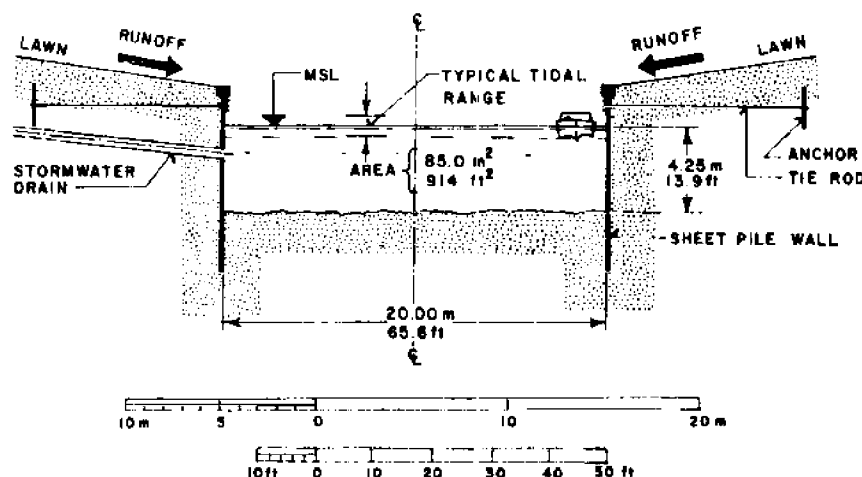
Conventional Bulkheaded Rectangular Canal Section.
